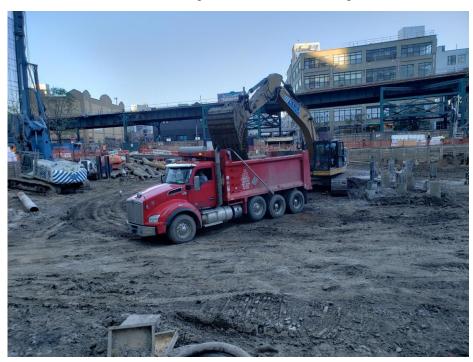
ECD loading non-hazardous soil/fill from WCG COMP F into a disposal truck (facing west).
